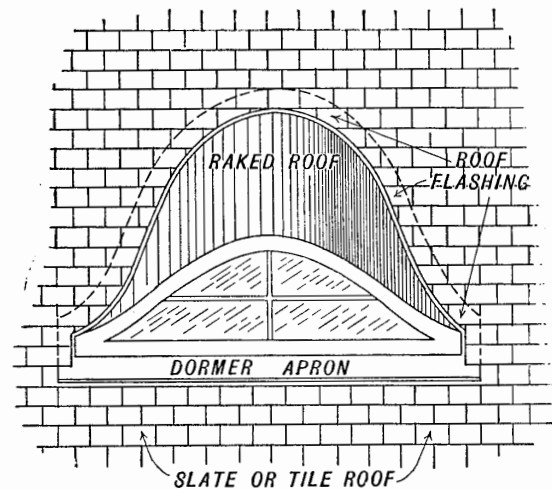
View of Curved Dormer Window, Requiring a Raked Roof and Roof Flashings
